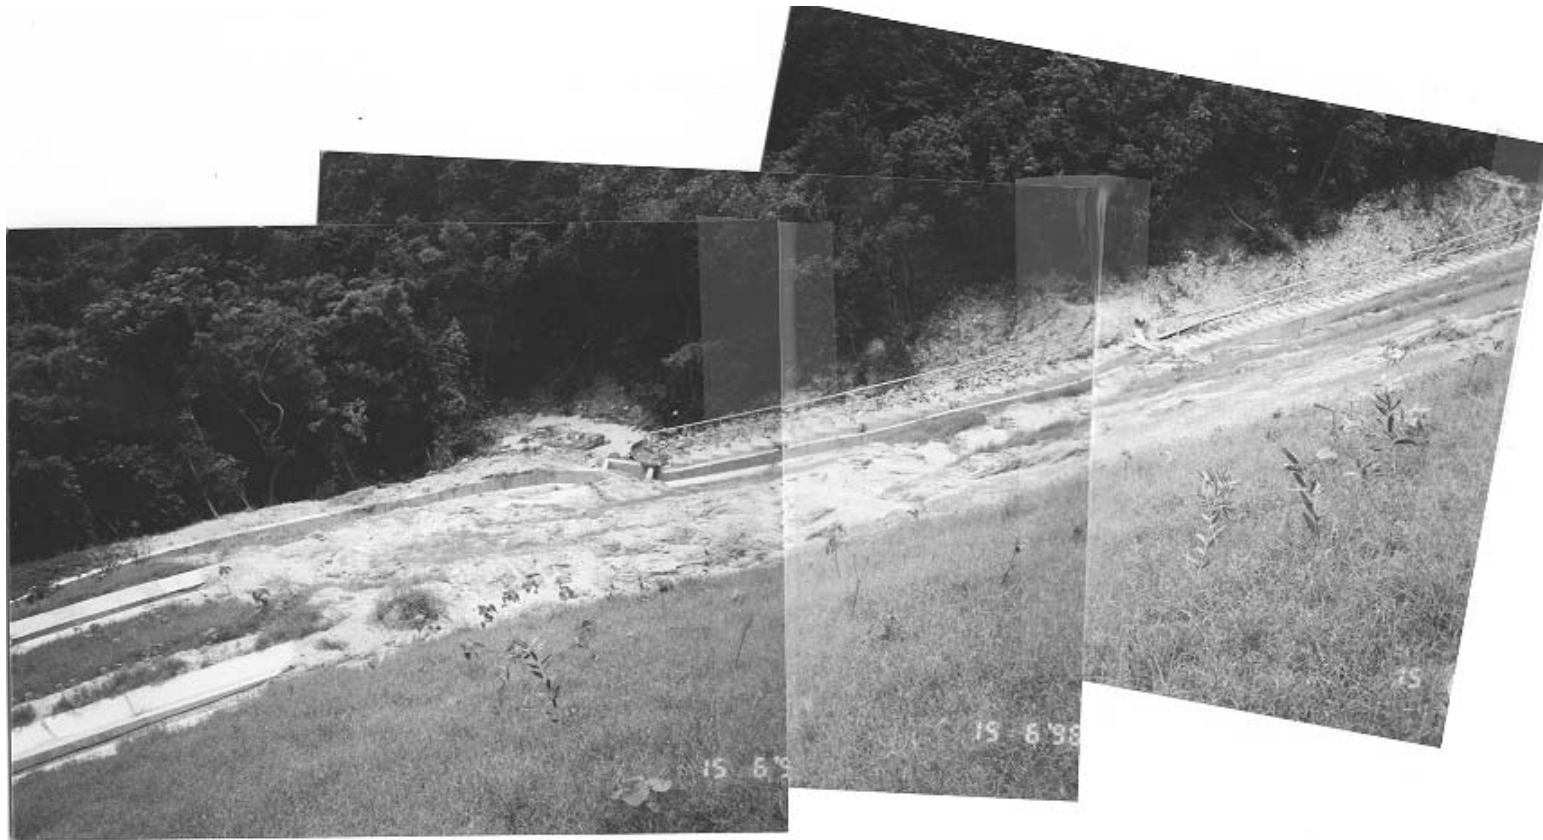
Event No. 3: 9 June 1998. View South from 45 mPD Berm on Slope B Indicating Debris Runout from New Failure in Batter Above 37.5 mPD Berm to Batter Below and Beyond Toe of Slope. (Photograph Taken on 15 June 1998)
